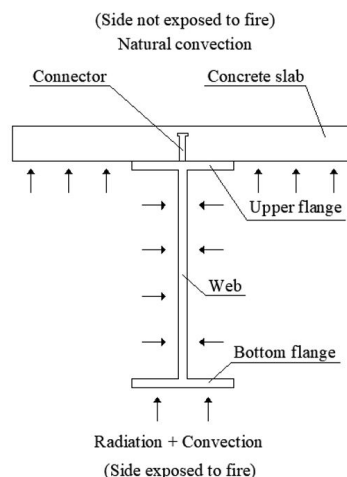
Proposed model of composite steel and concrete beam in a fire situation.
